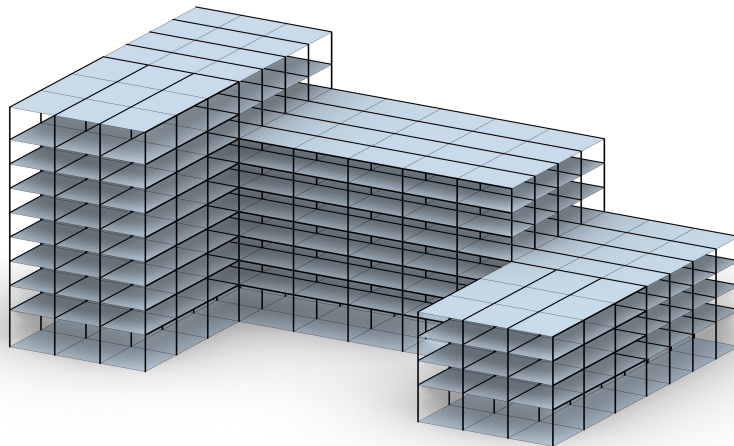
A structural system for the building volume, shown in Figure 5.3.
